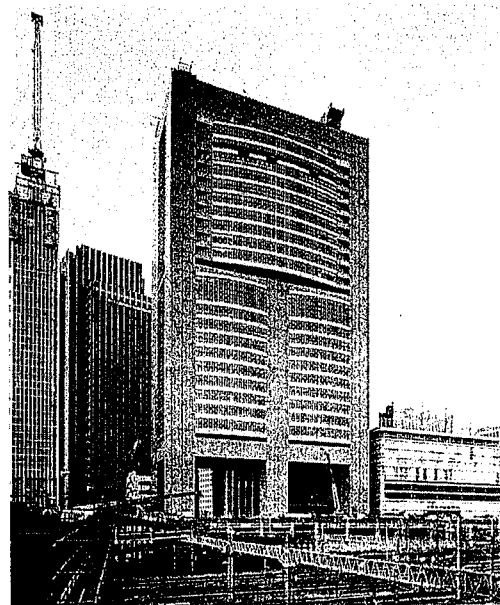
Application of 60-kgf/mm<sup>2</sup> steel (JR East Japan Headquarters Building)
